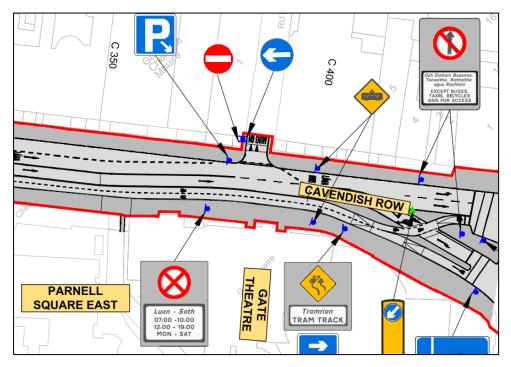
Extract from Traffic Signs and Road Markings drawings (Sheet 36)
